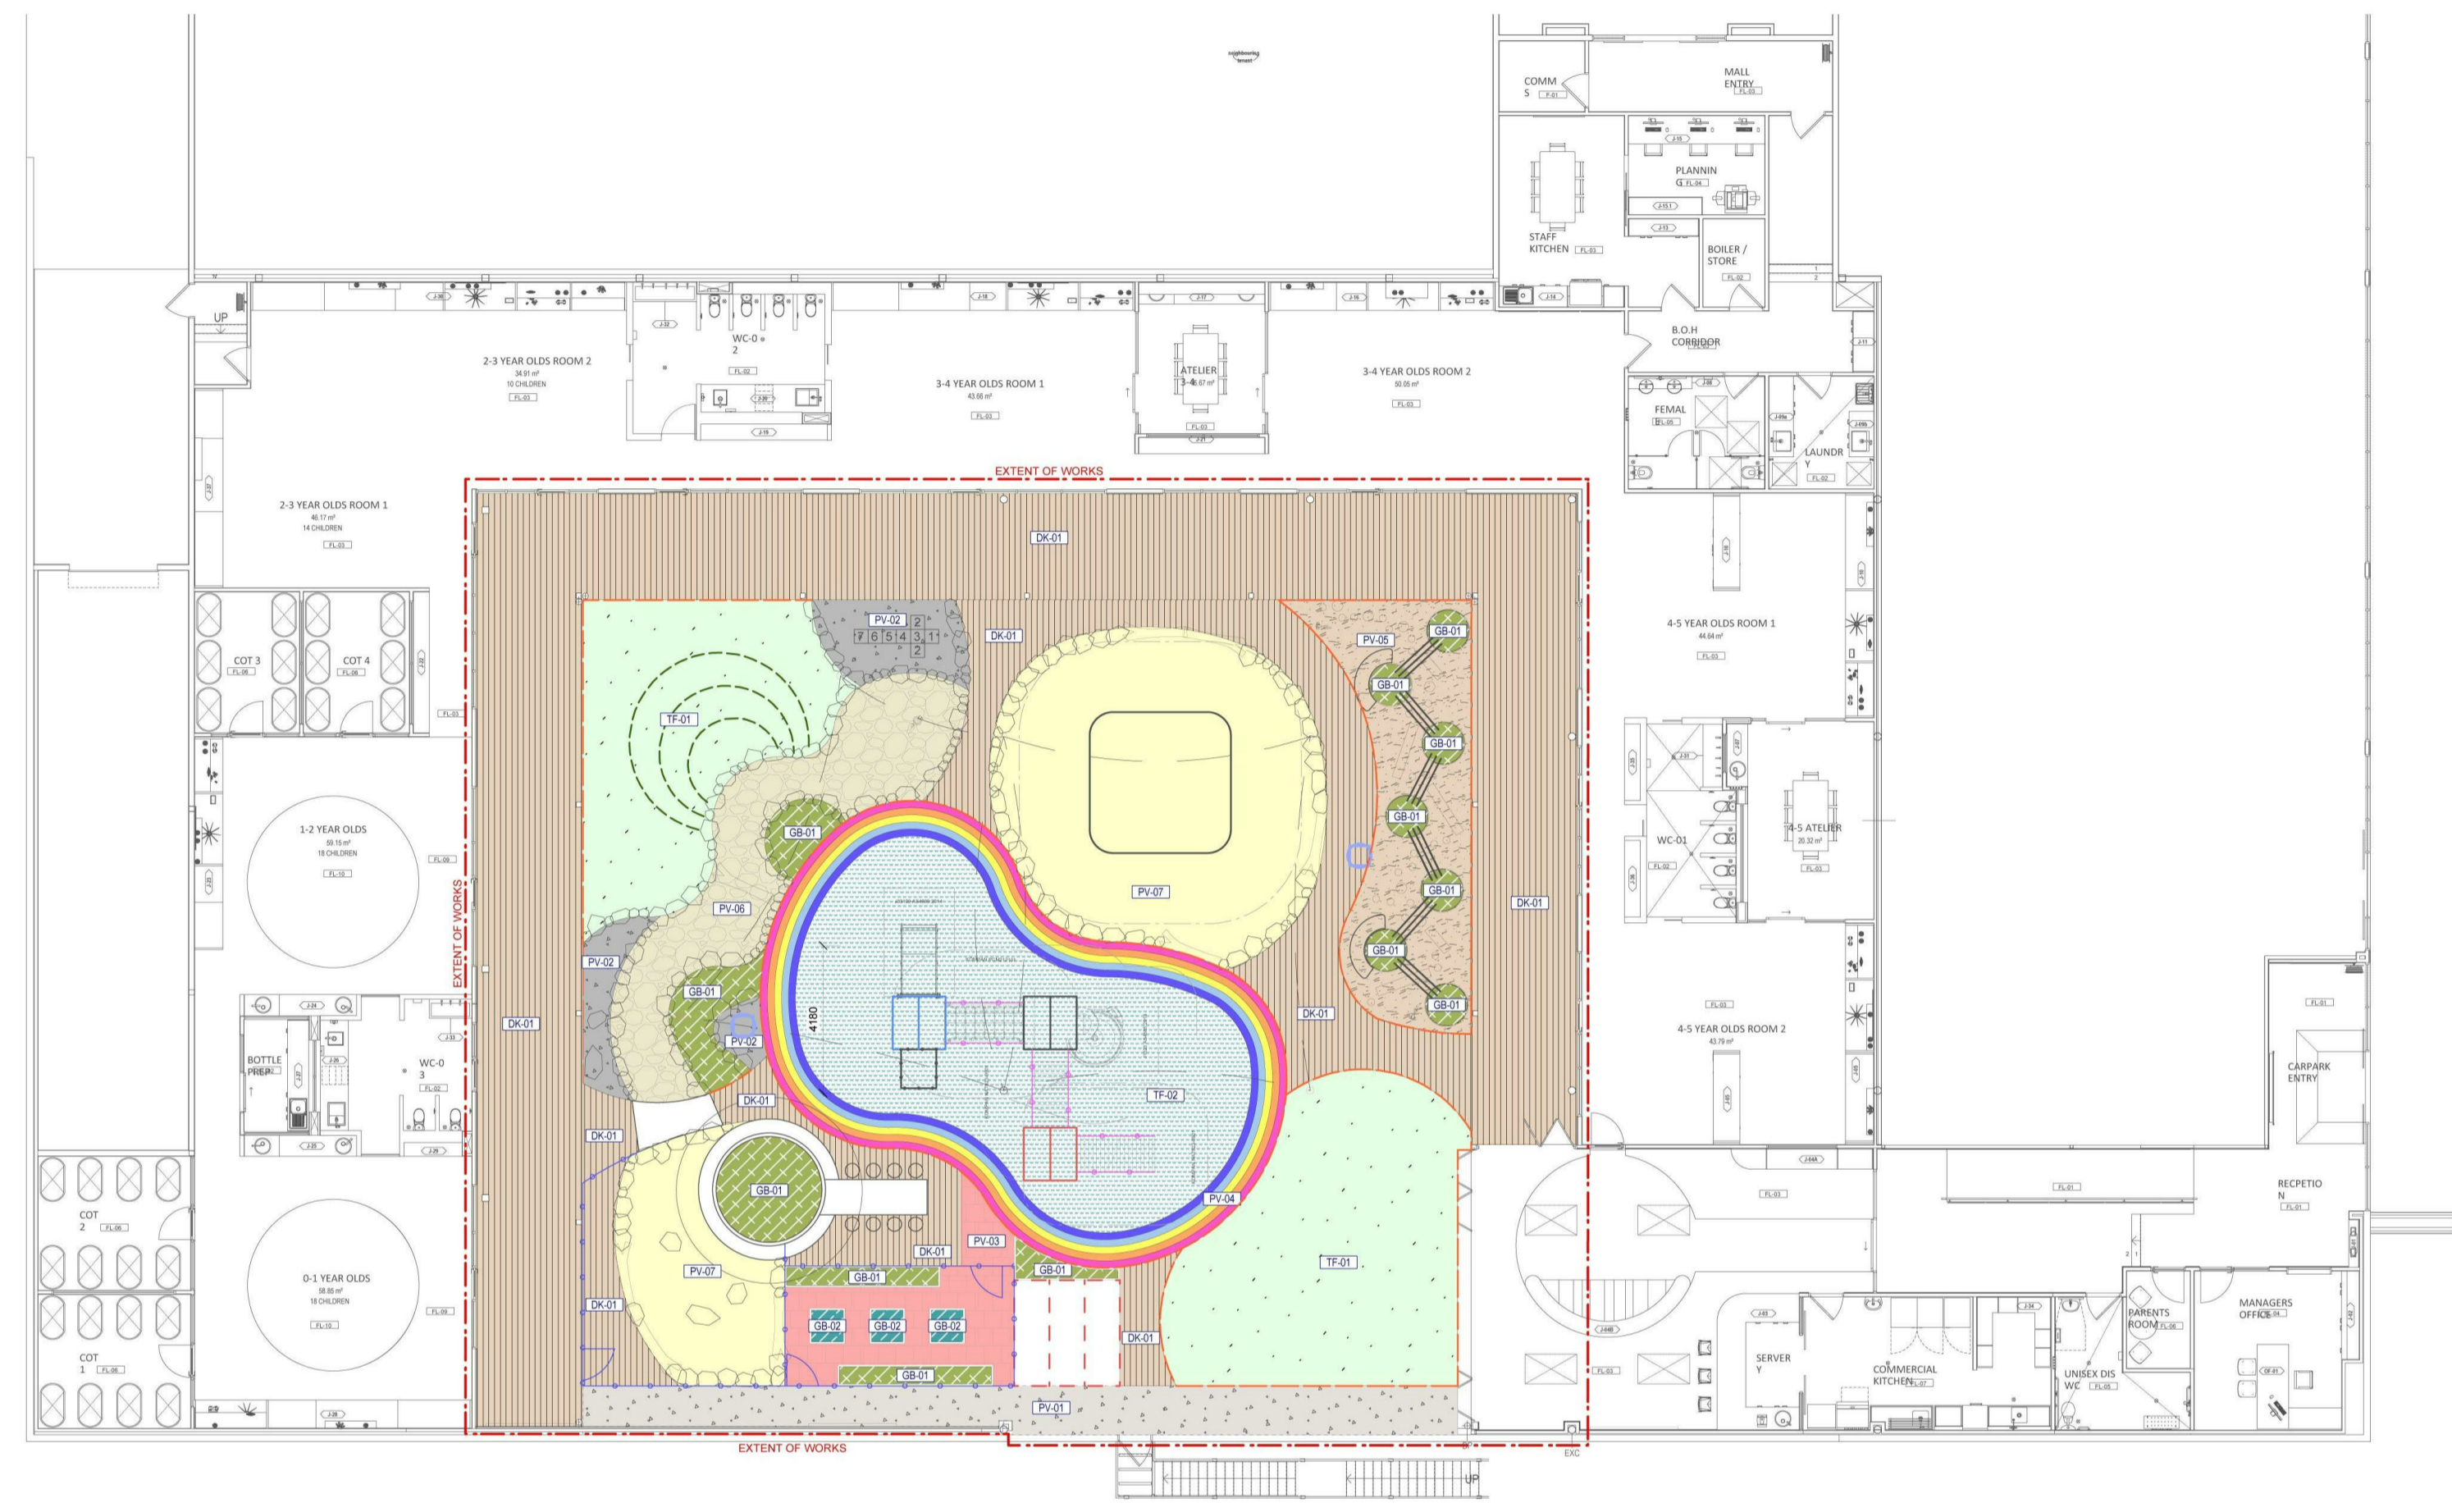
PLAN ILLUSTRATING SIMILAR DESIGN ELEMENTS TO BE INCLUDED IN FUTURE LANDSCAPE DESIGN
